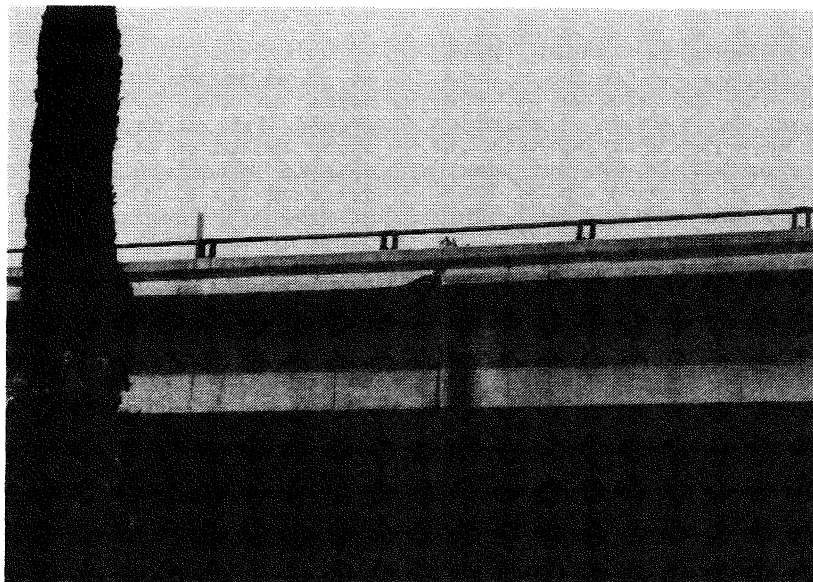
210 FREEWAY OVERPASS AT SECOND AVENUE, ARCADIA
